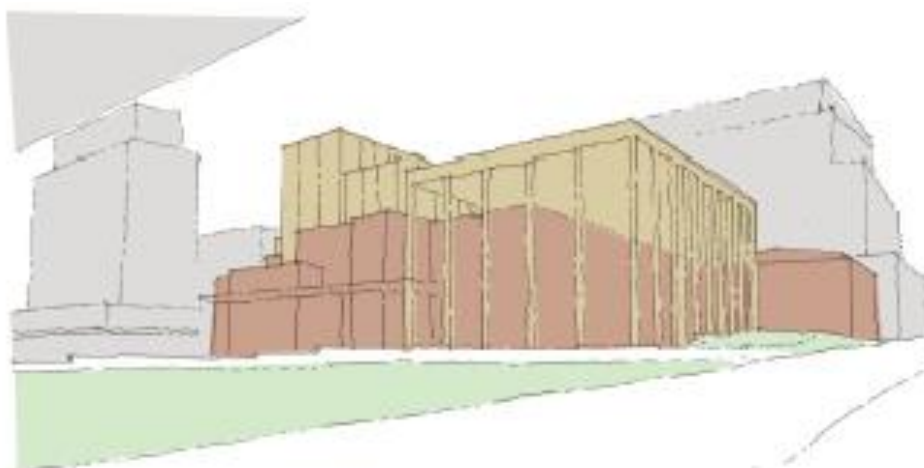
Potential future urban context of SEC as viewed from Eton Street
